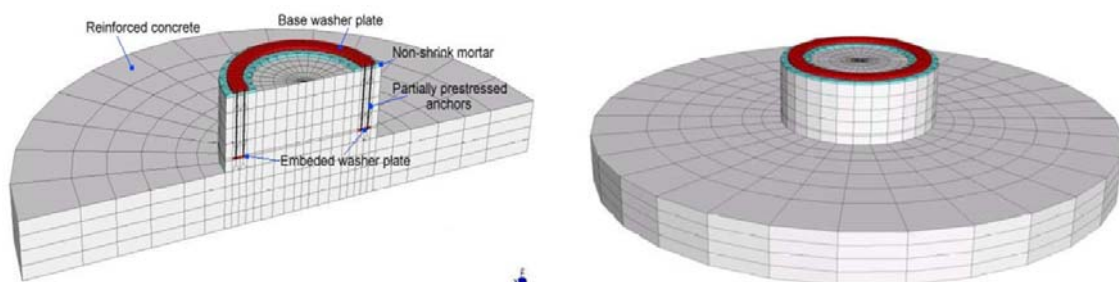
Cross section of the foundation FE model (left) and the foundation FE model (right)
